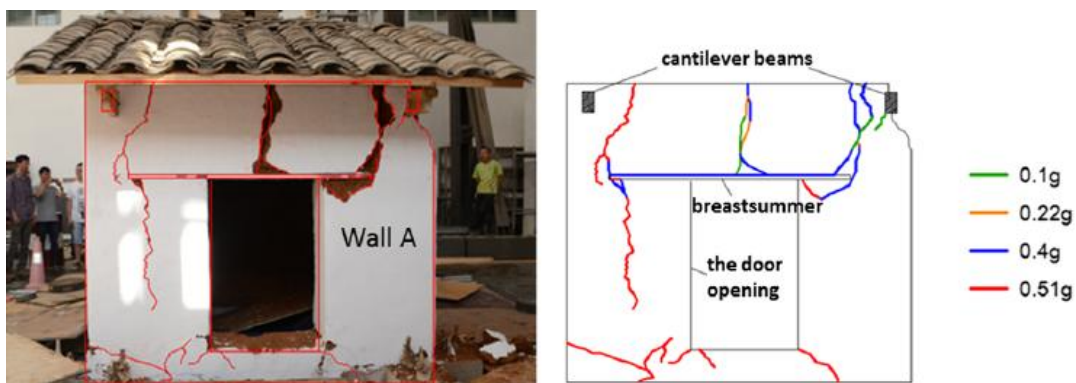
Developed crack patterns at unreinforced rammed earth building tested on shaking table (Wang *et al.*, 2016)
